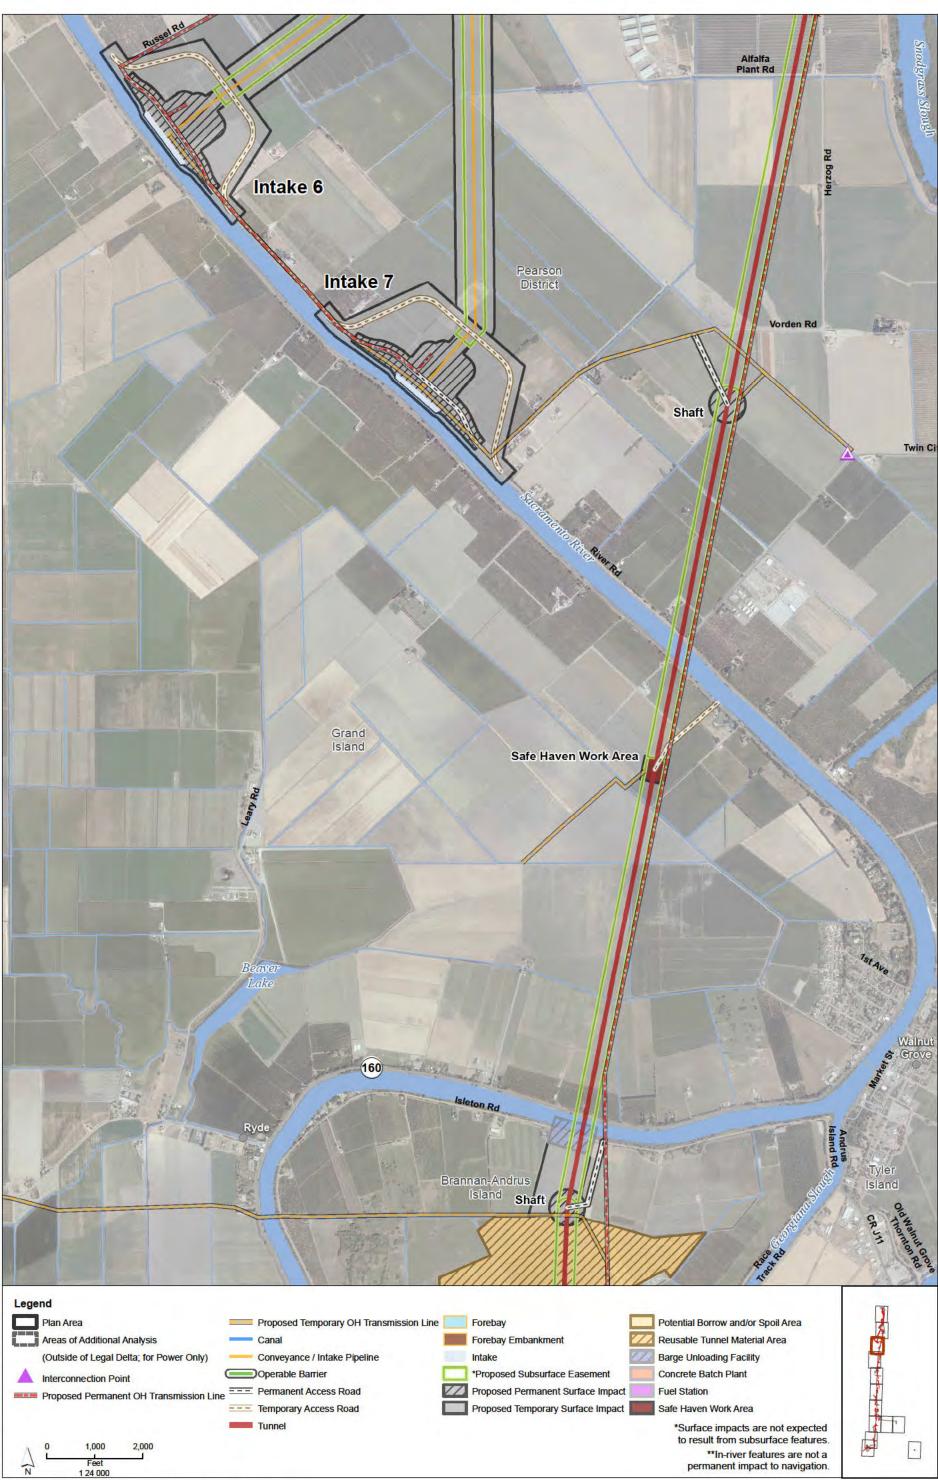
Sheet 3 of 13 Pipeline/Tunnel Alignment (Alternatives 1A, 2A, 3, 5, 6A, 7, and 8)
